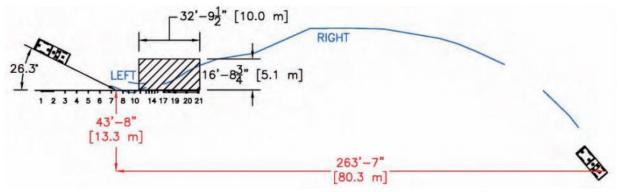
Test Impact Drawings for Test No. MWTSP-2.
